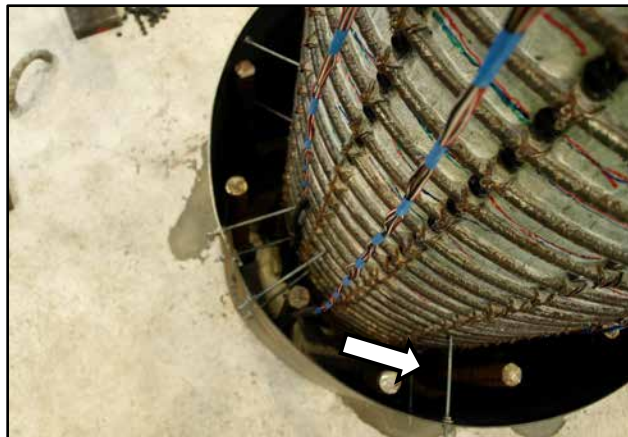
Steel sleeve with threaded rod spacers bearing against column.
